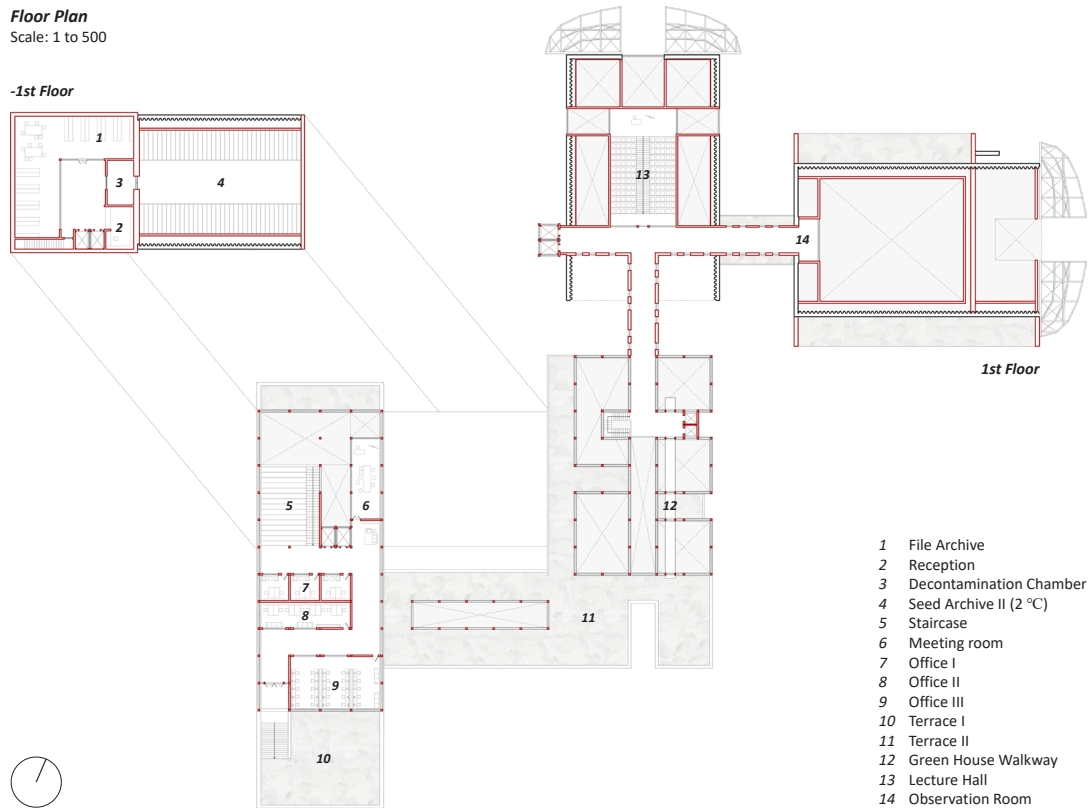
Basement Floor Plan and First Floor Plan
